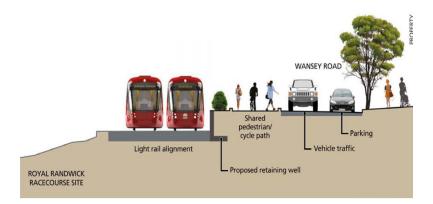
PIR proposed light rail alignment along Wansey Road indicating change of levels impacting on access from Wansey Road to RRR (Source: PIR)
